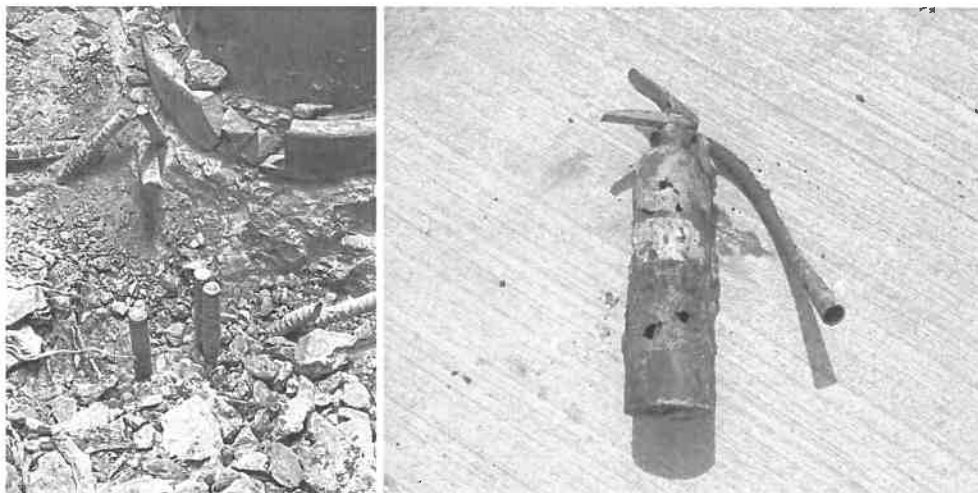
Standpipe Concrete Encasement and Obstruction
